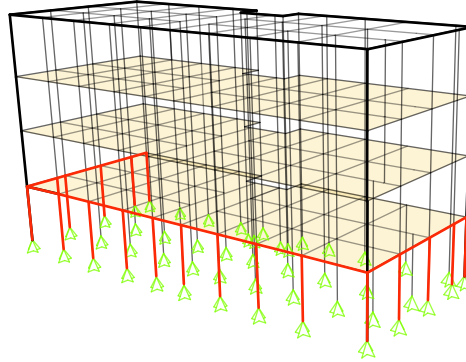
Retrofit 6: Addition of Steel Moment Frames Entirety of Soft-Story.
